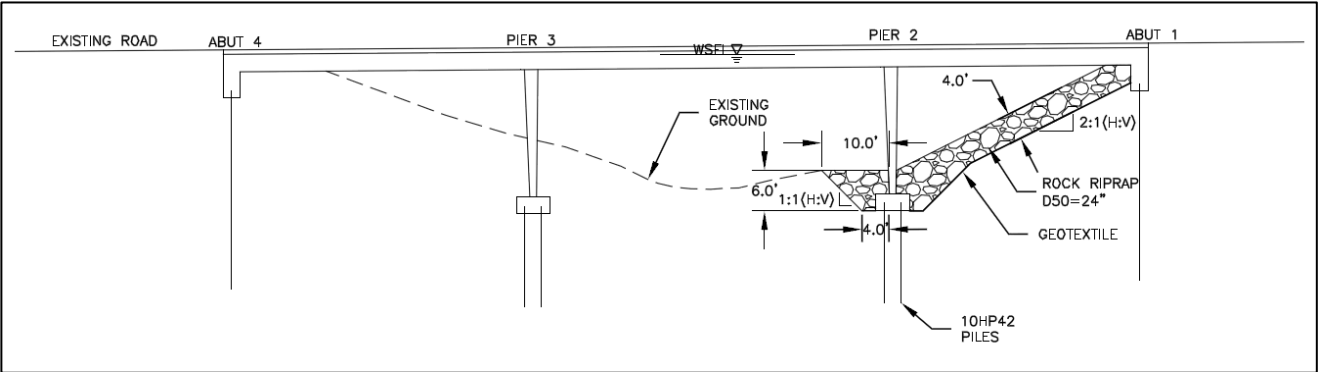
Cross-sectional view of Bridge B-06-S with recommended hydraulic scour countermeasures
